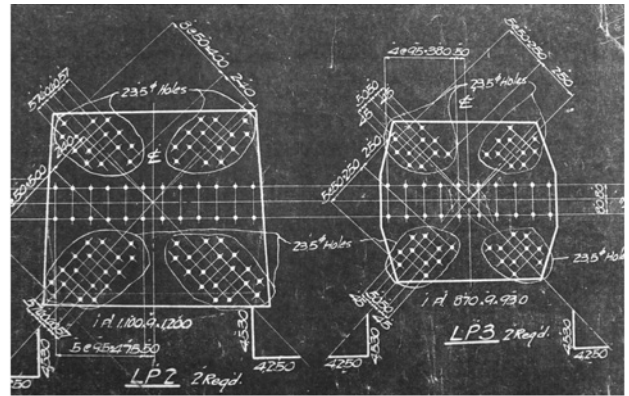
Gusset Plate of Lateral Bracing (Owari-Ohashi Bridge)
